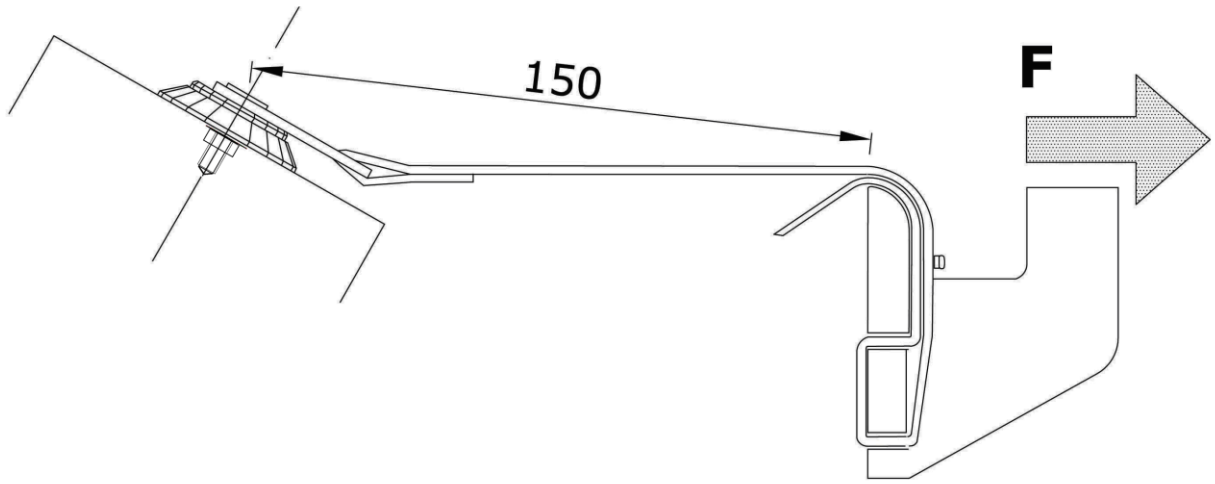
Apparatus for testing FHR -tethers and Anchorages (30 degree test)
